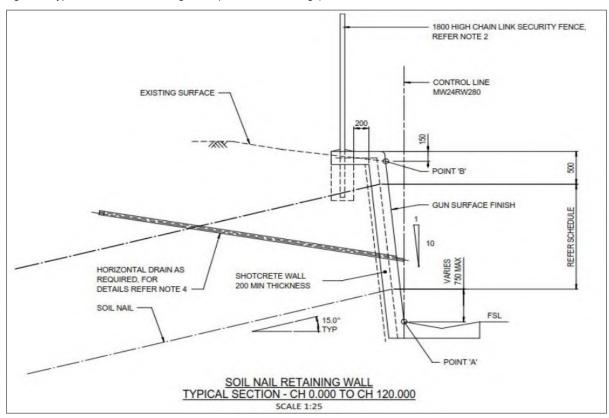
Soil Nail Typical Detail (North of Land Bridge)
